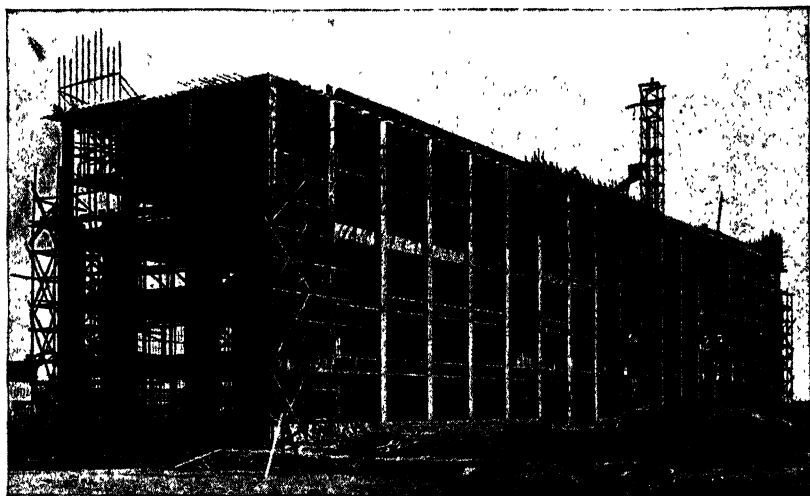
Placing Brick Veneer on Concrete Building. (See p. 612.)
